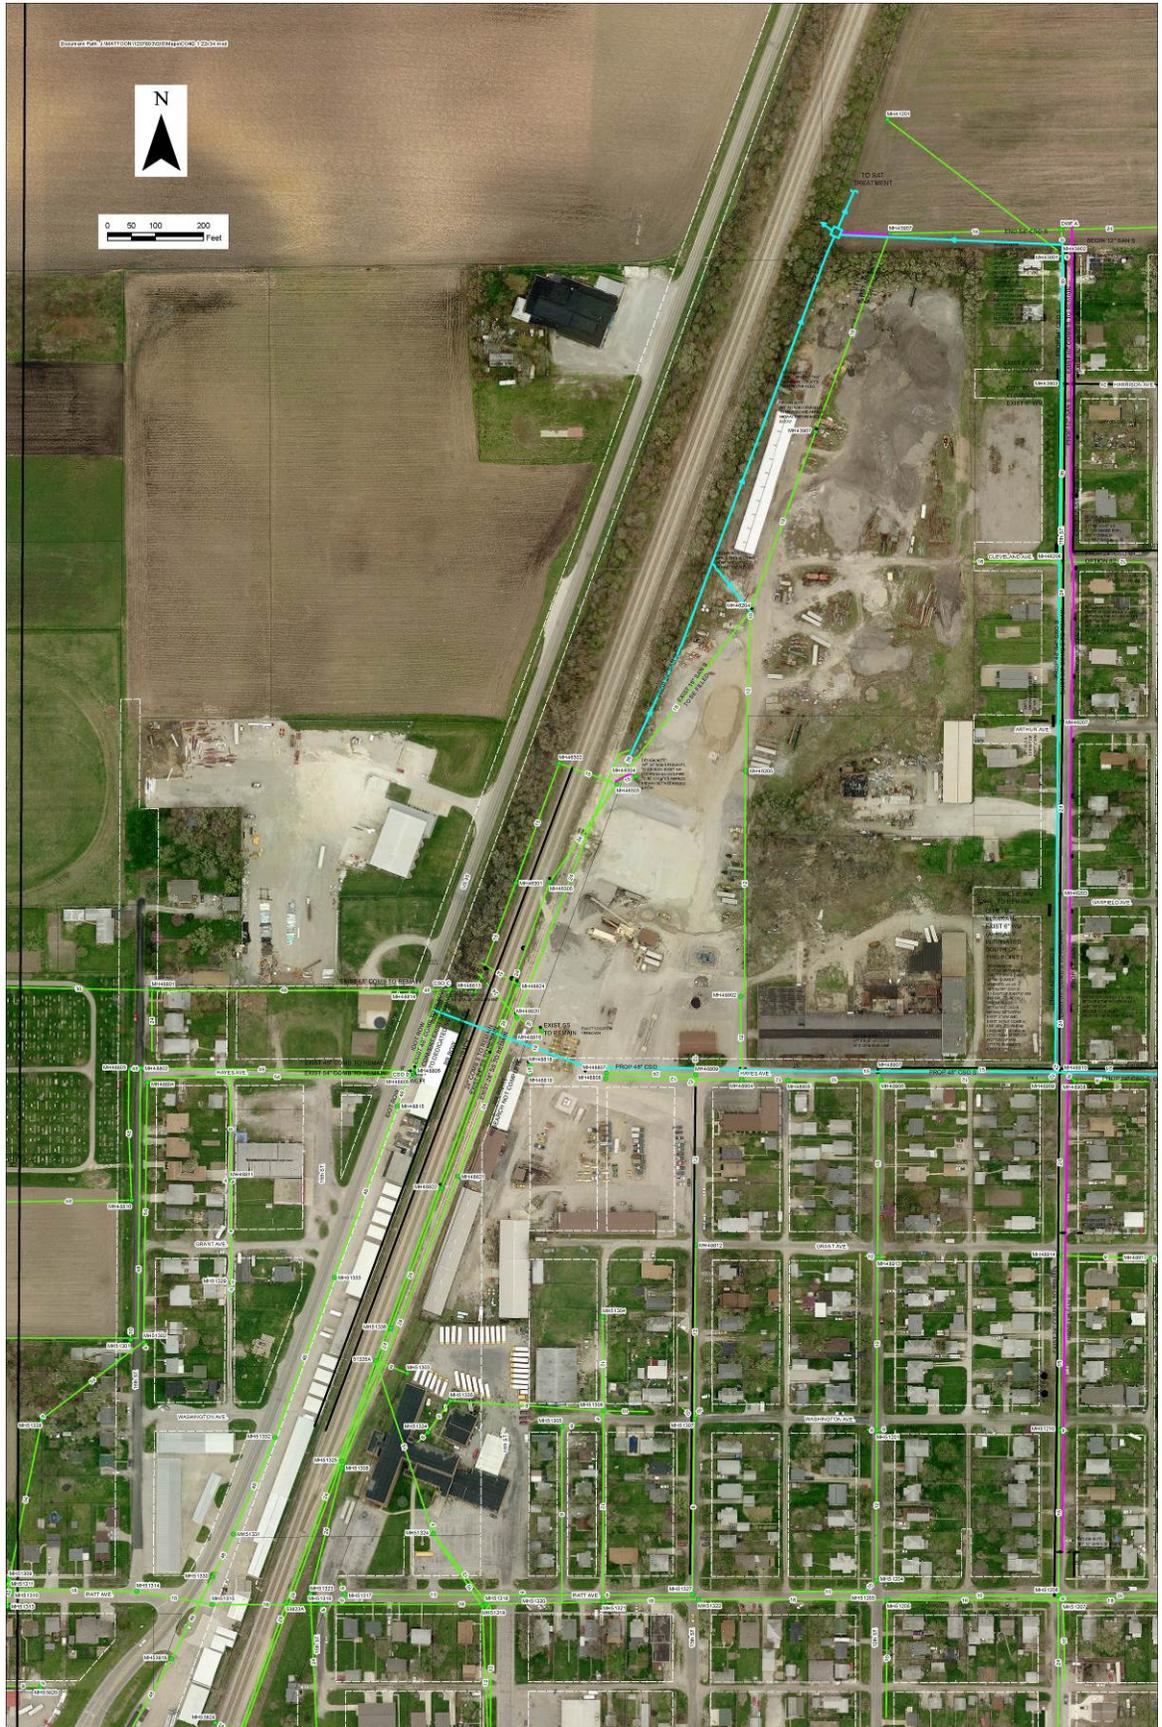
REVISED CONVEYANCE SEWER ALIGNMENT
